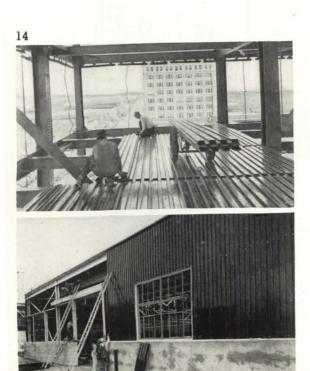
Hauserman Masterwall system (partitions, wall surfacing) is modularly designed, coordinates well with heating equipment, etc. Example shows office of Chairman of the Board, Firestone Tire and Rubber Co.; Voorhees, Walker, Foley & Smith, Architects. Fig. 13: Fairhurst Unitfold partitions (International Steel Co.). Fig. 14: H. M. Robertson Co.'s Q-Floor and Q-Panels (for walls) being installed.
